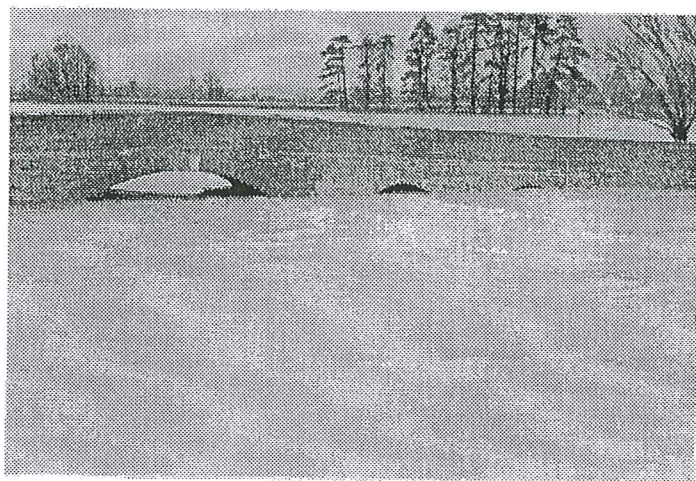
FLOOD CONDITIONS AT TWO BRIDGE SITES
